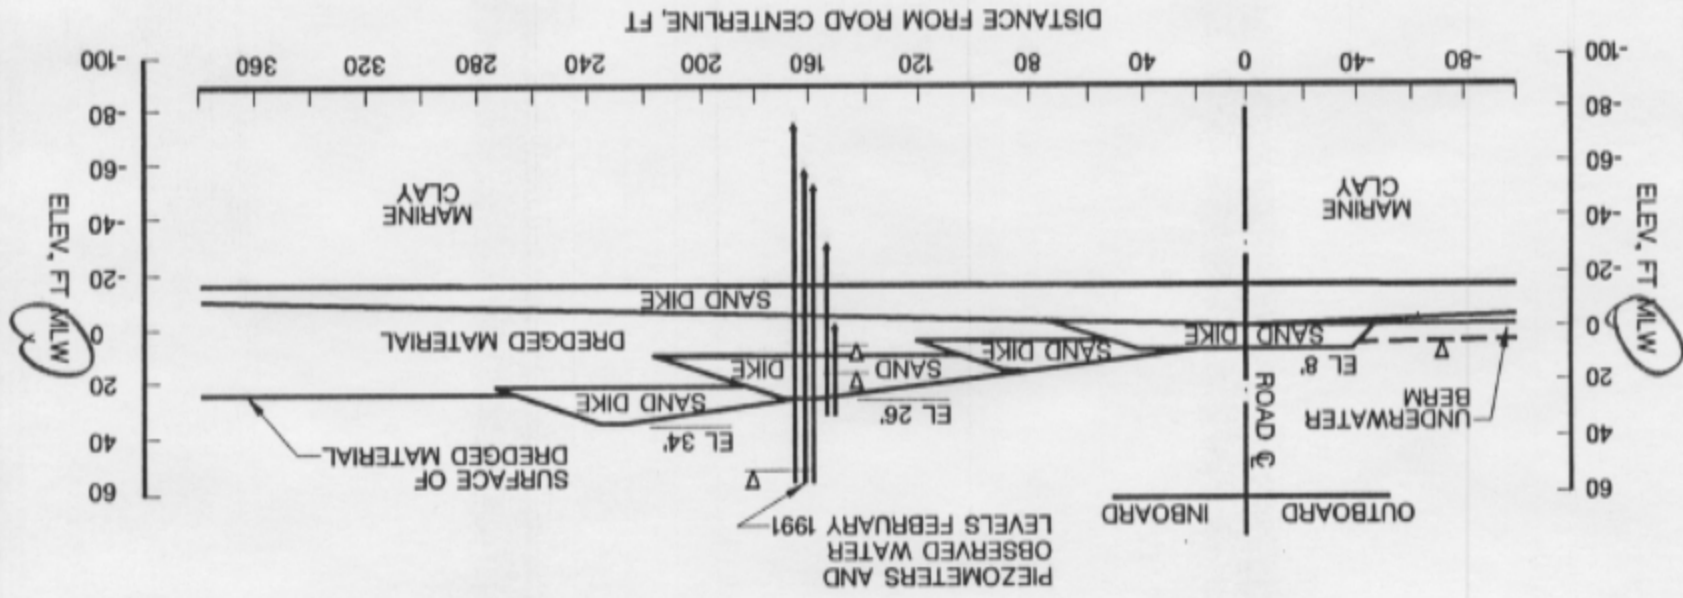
Generalized Cross-Section, Northwest Corner Perimeter Dike
